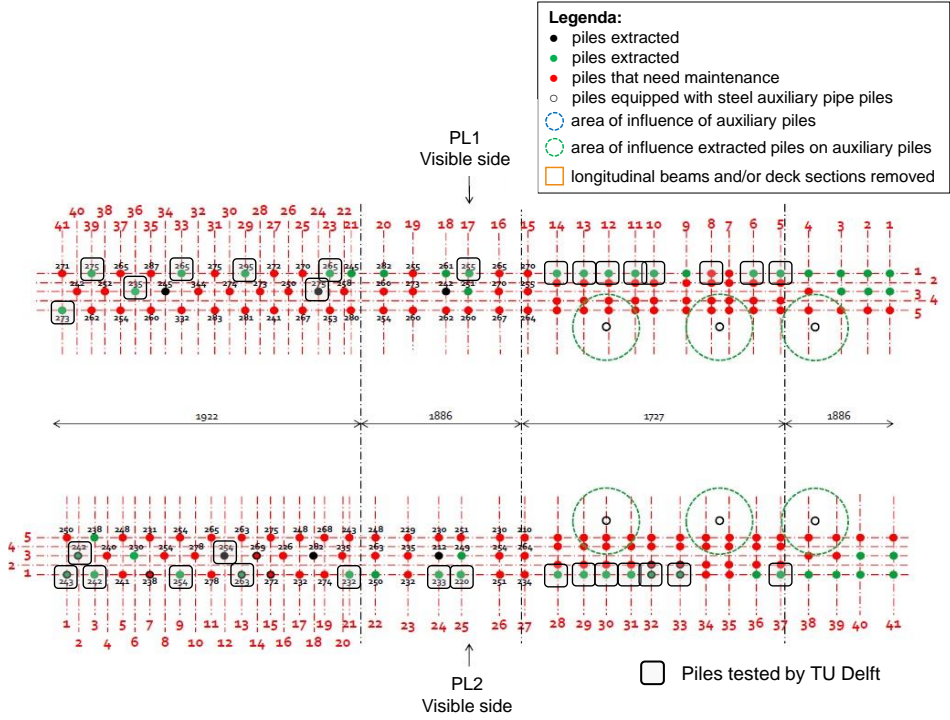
Plan of piles layout of bridge 41 in Amsterdam.
